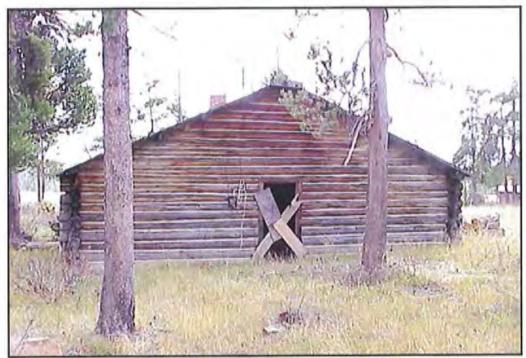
West wall of HS-1162, the Bathhouse. Source: A&E Architects, 2004.
